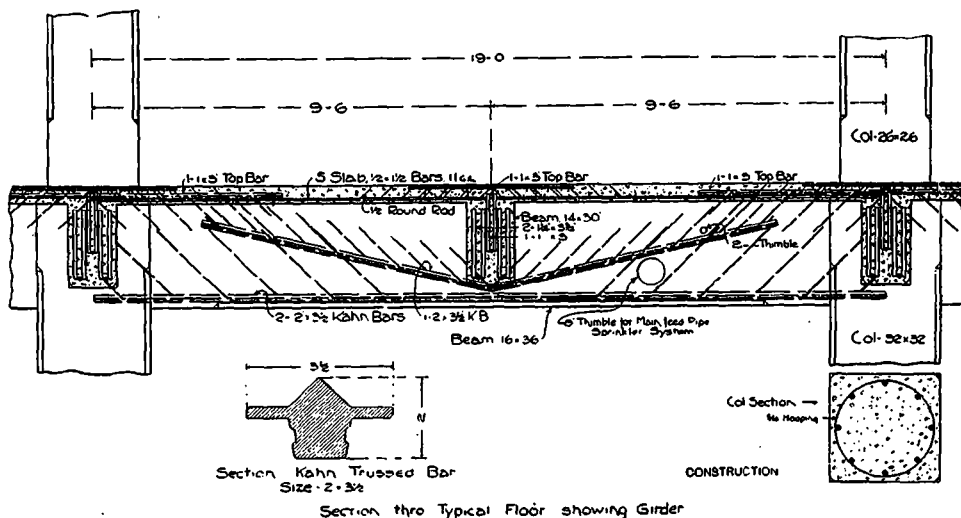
SECTIONAL DIAGRAM OF TYPICAL GIRDER, ANDREW DARLING BUILDING, TORONTO, SHOWING ARRANGEMENT OF REINFORCING STEEL WHICH CONSISTS OF TWO 2 IN. X $3\frac{3}{4}$ IN. KAHN BARS, HAVING SHEAR DIAGONALS 30 IN. IN LENGTH AND ONE 2 IN. X $3\frac{1}{2}$ IN. KAHN BAR, HAVING SHEAR DIAGONALS 18 IN. IN LENGTH.
